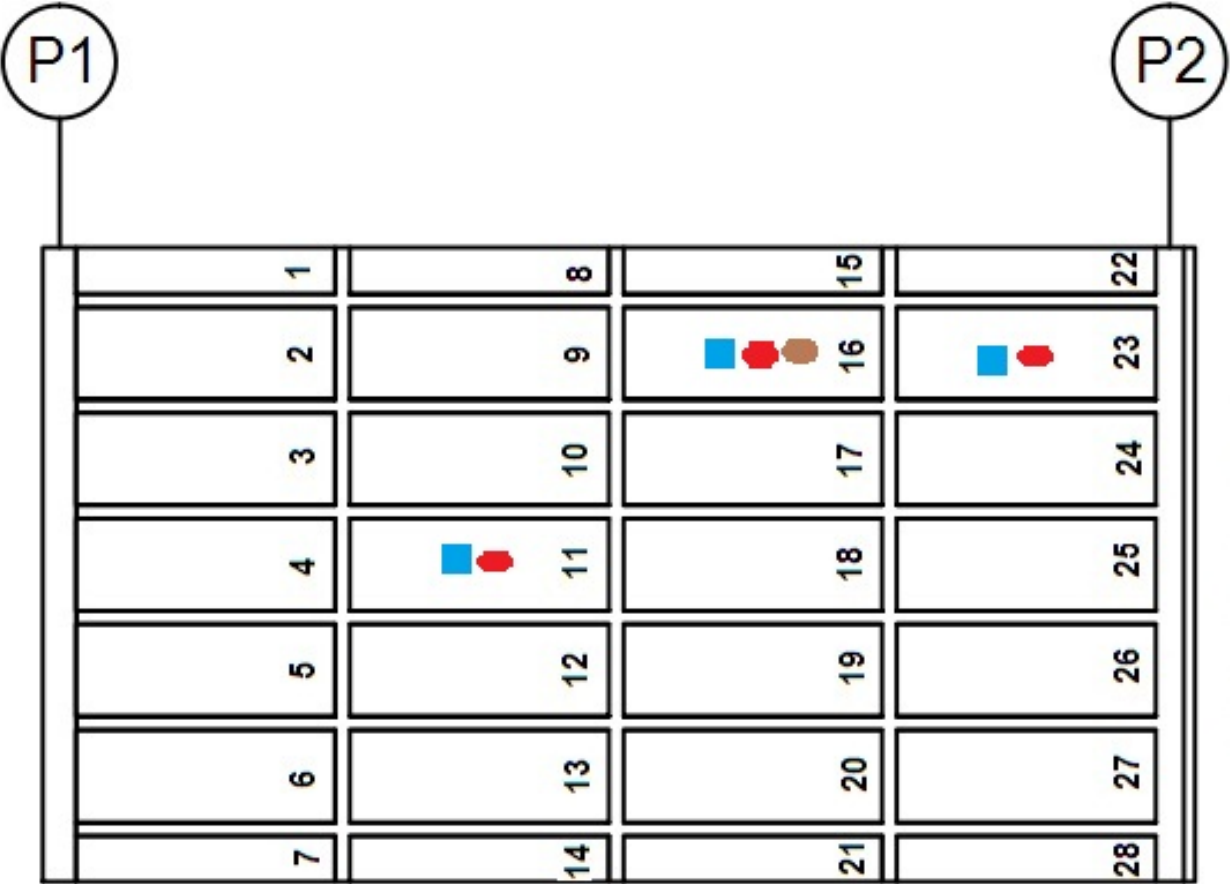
Test conducted at various locations between Pier P1 and Pier P2
